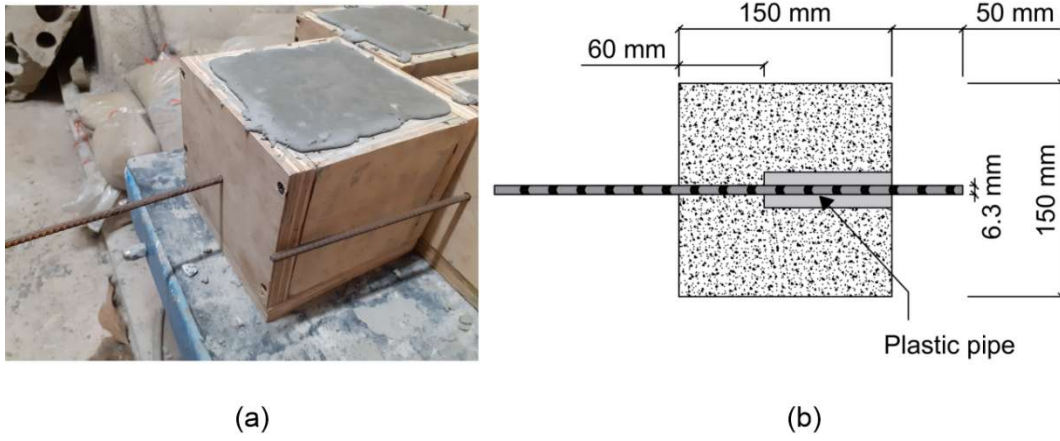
Pull out specimen details: (a) specimen molding and (b) dimensions.
